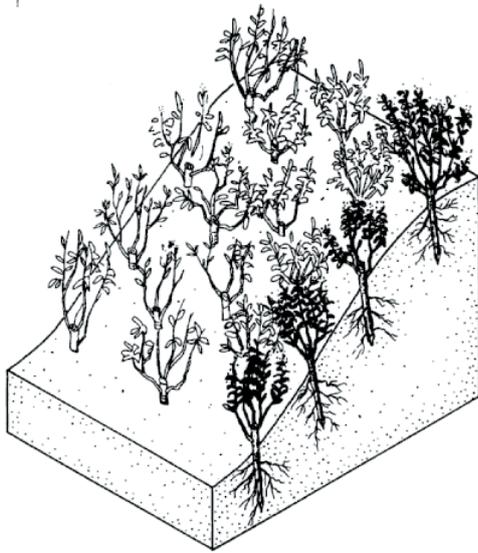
Planting tree on the bank slope Fig99. Planting tree on bank top and grasses on the bank slope
